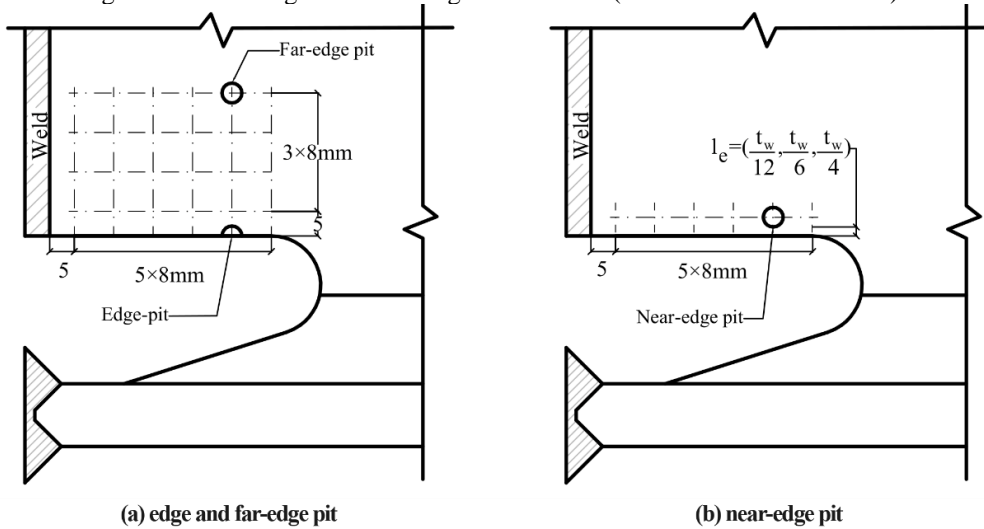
Pit location grid on the web of the beam (all dimensions are in mm).
